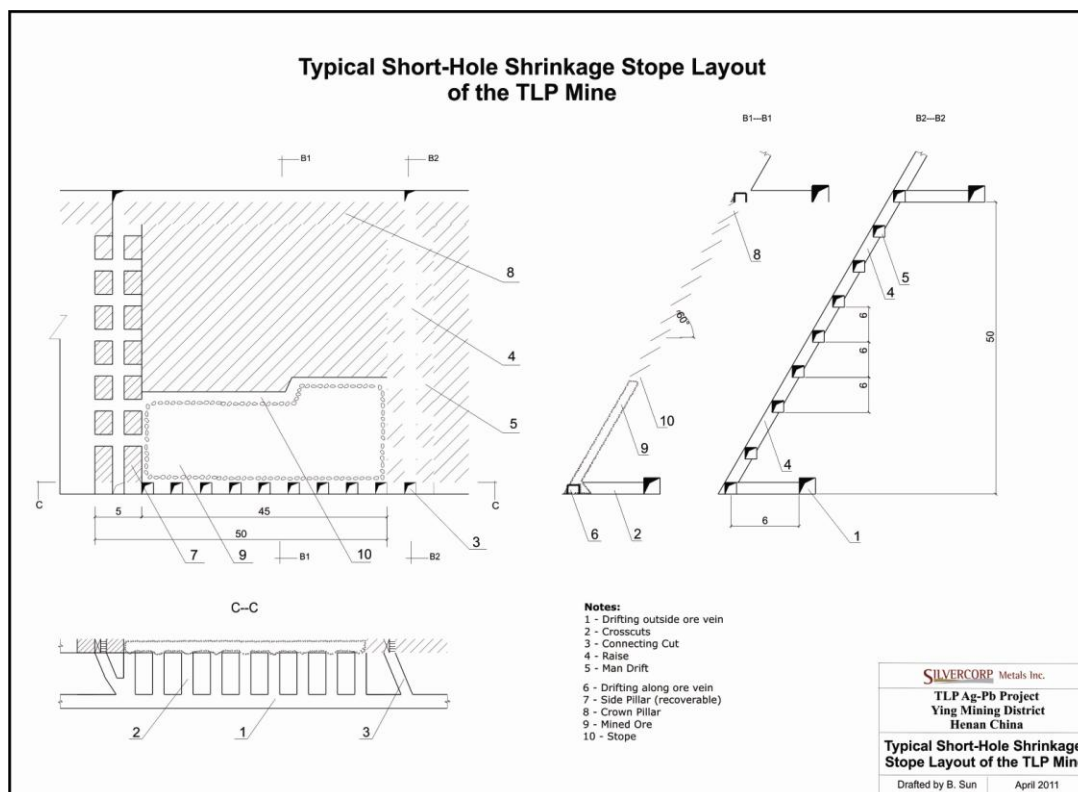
Typical short-hole shrinkage Stope Layout of TLP and LM mines
